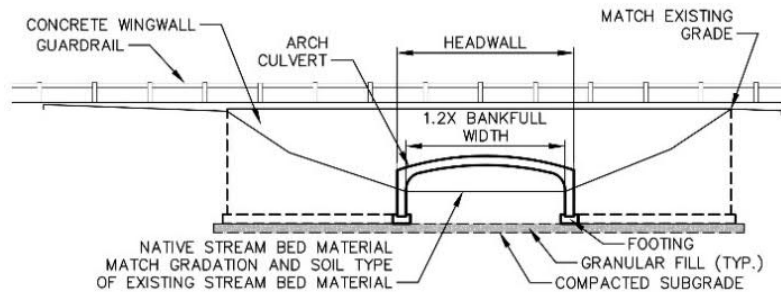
Typical detail of an open arch culvert designed to meet MA Stream Crossing Standards
